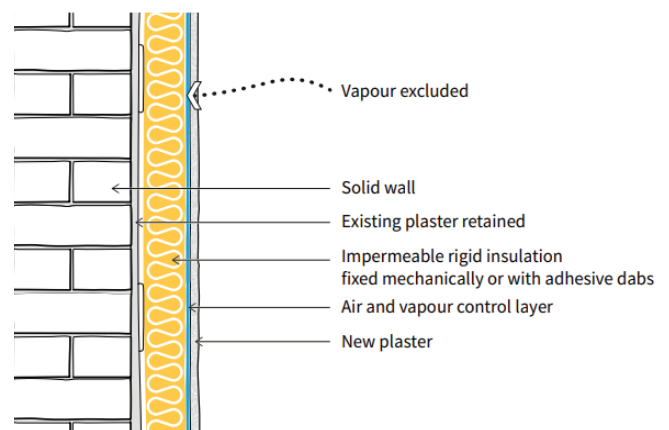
INTERNAL SOLID WALL INSULATION (HE INSULATING SOLID WALLS 2016)
